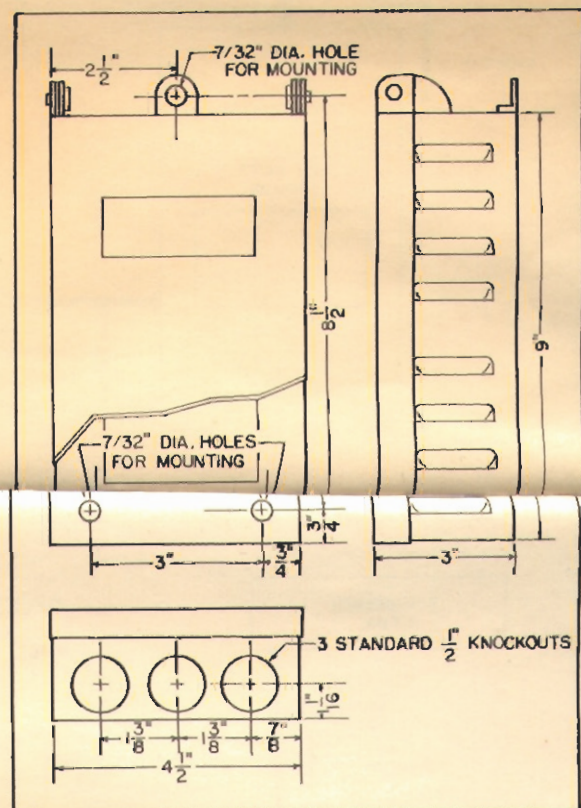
Roughing In Dimensions for Auxiliary Bulb Panel Box.
